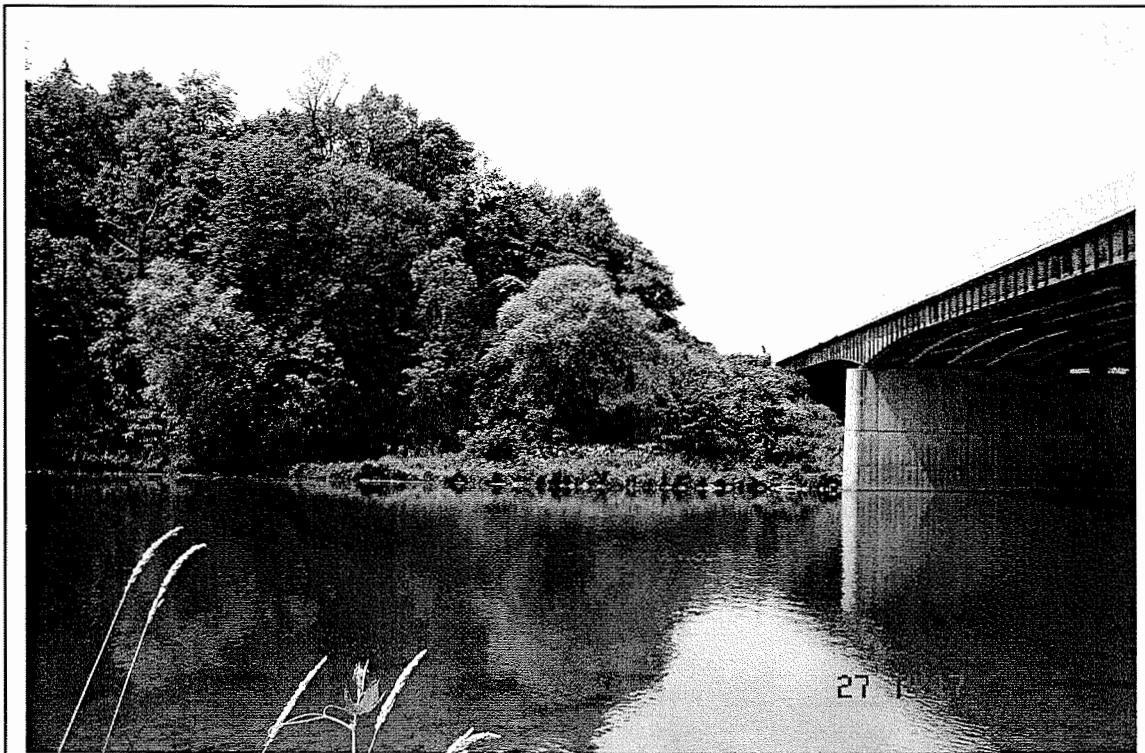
, July 2006 – Looking from flood plain on south side of Grand River towards North Abutment and Piers 1 and 2. Existing bridge on right side of photo.
